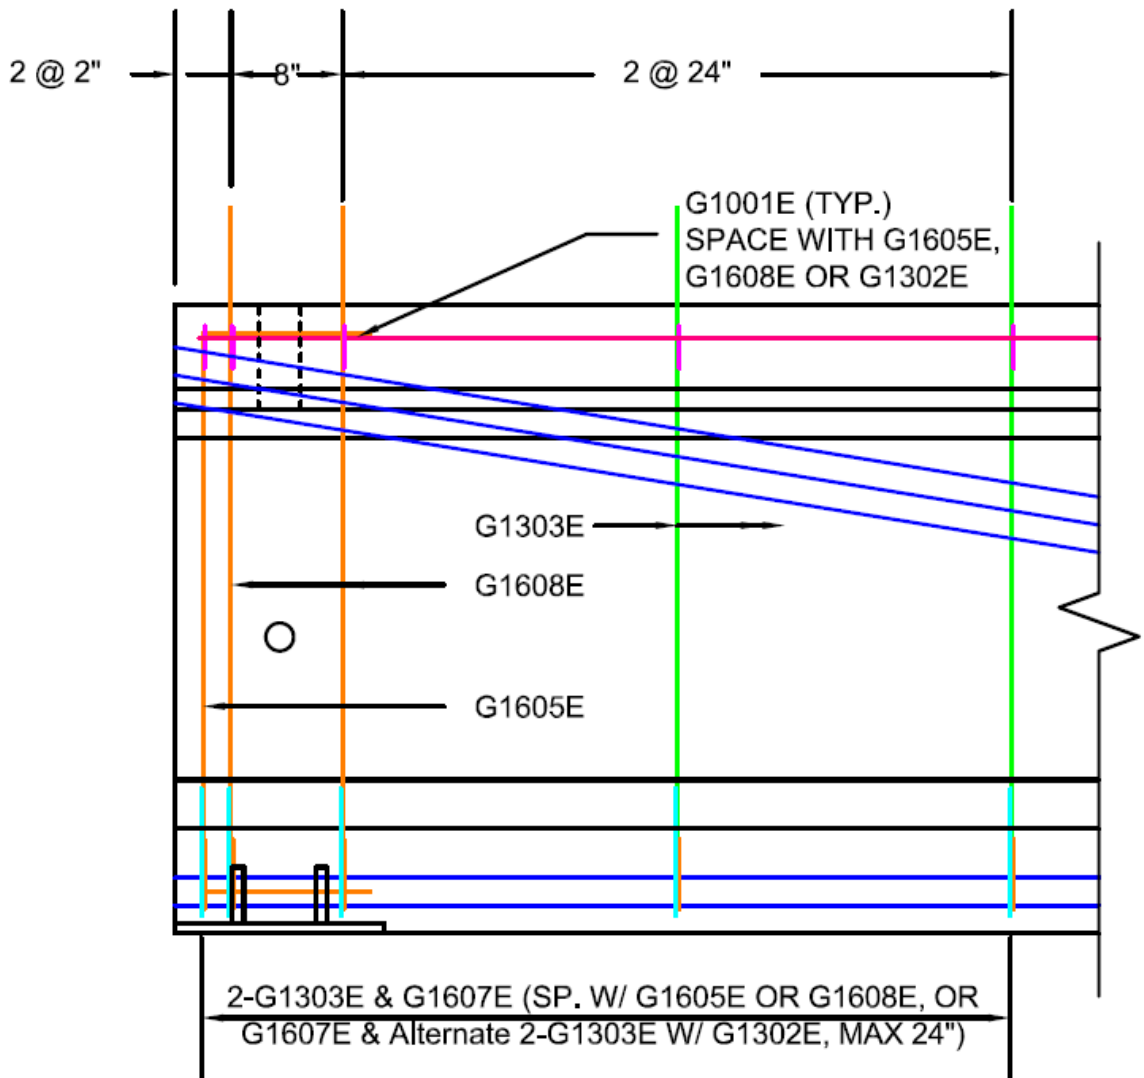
Transverse reinforcement layout for 45M_24W end.
